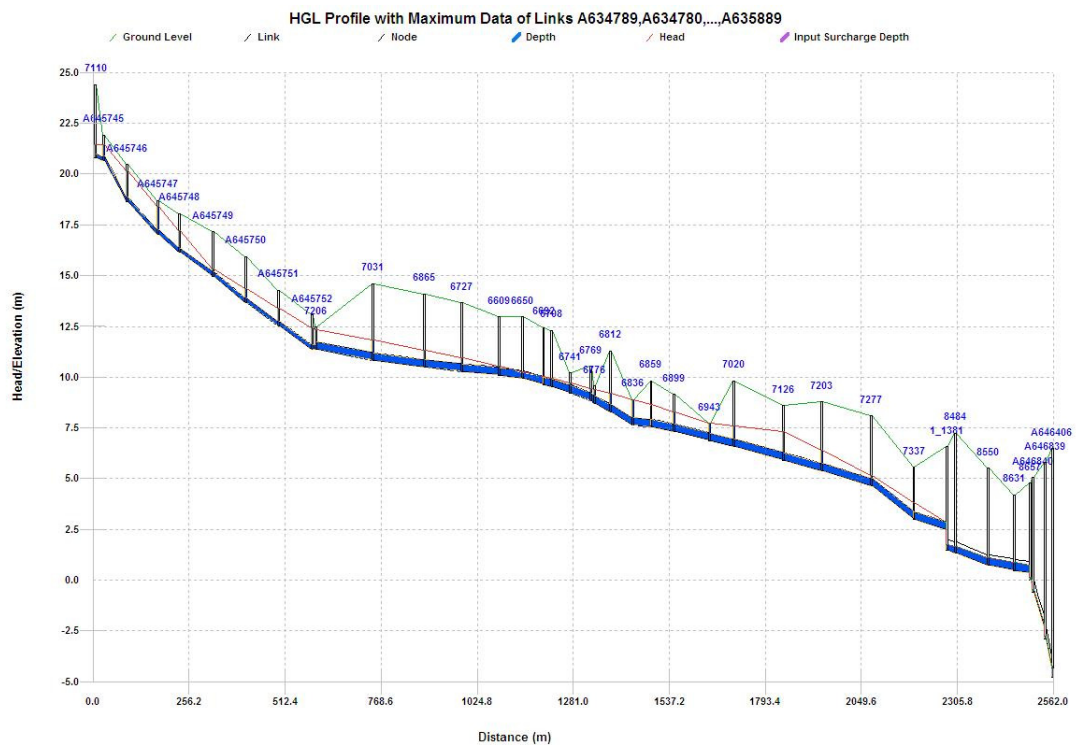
Ultimate Full Bellvista Stage 2 Development Longitudinal Section (Pumped to Manhole 7277)
